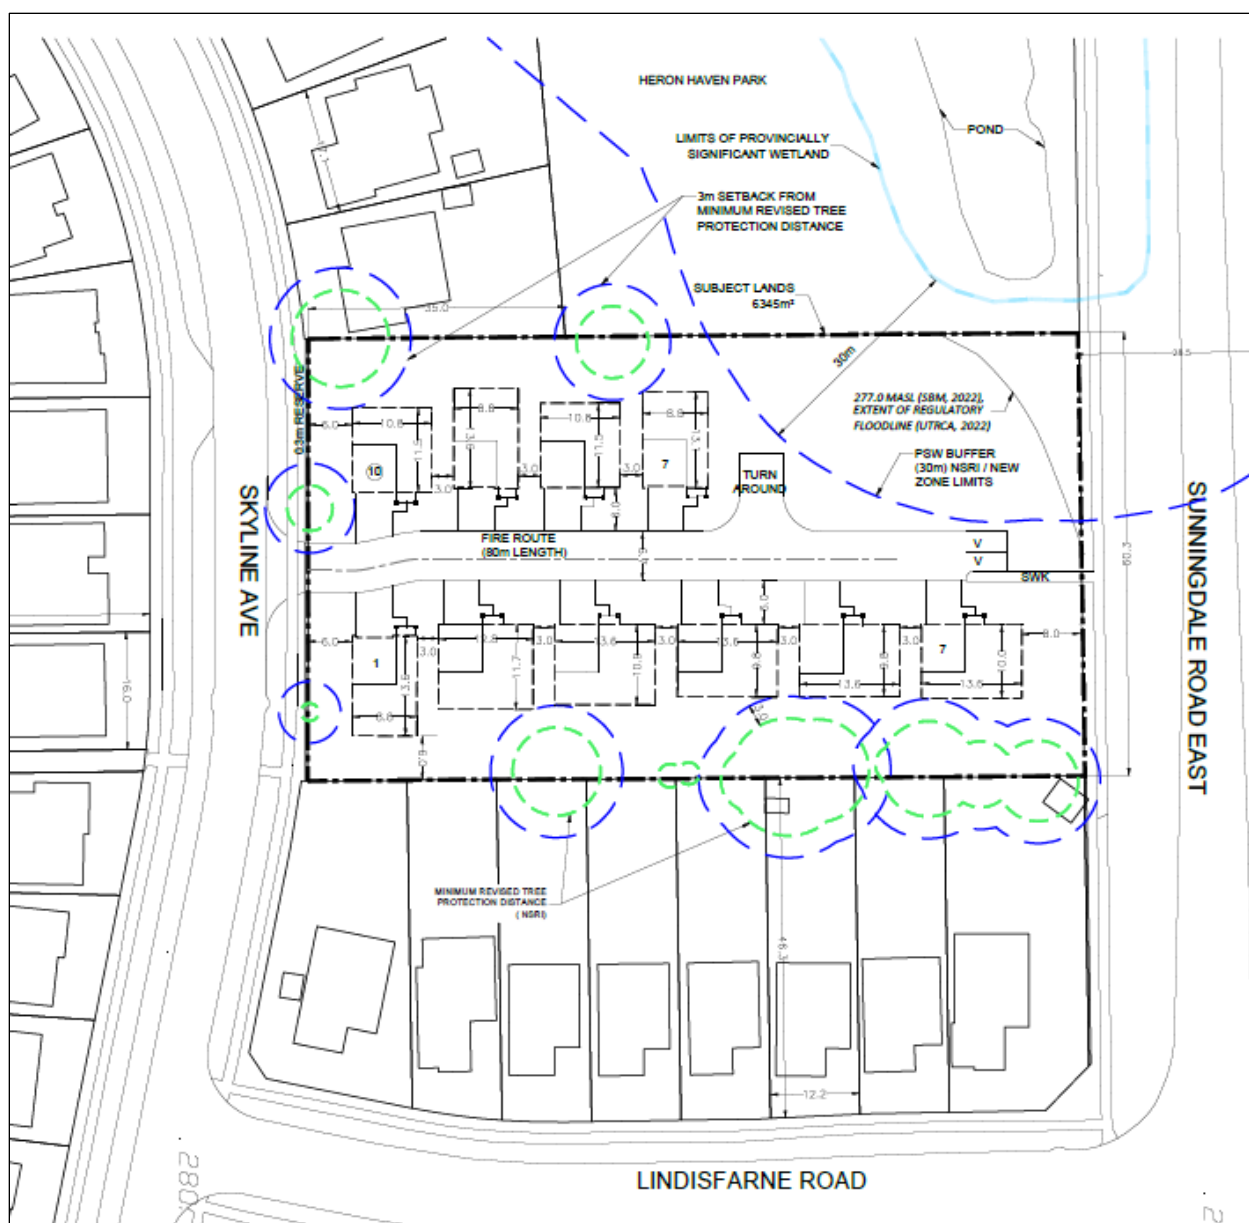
Revised Potential Development Plan for 307 Sunningdale Road East, October 4, 2022.
